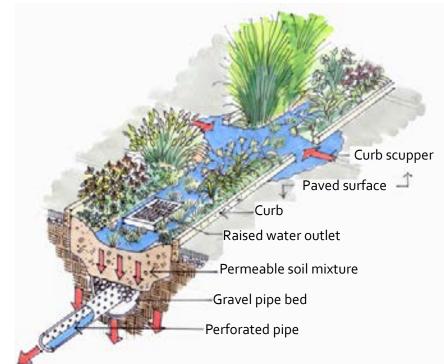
Indicative picture shows one type of combination of the underdrain system and raised water outlet implemented along the street. Source: http://bladesandgoven. com.
